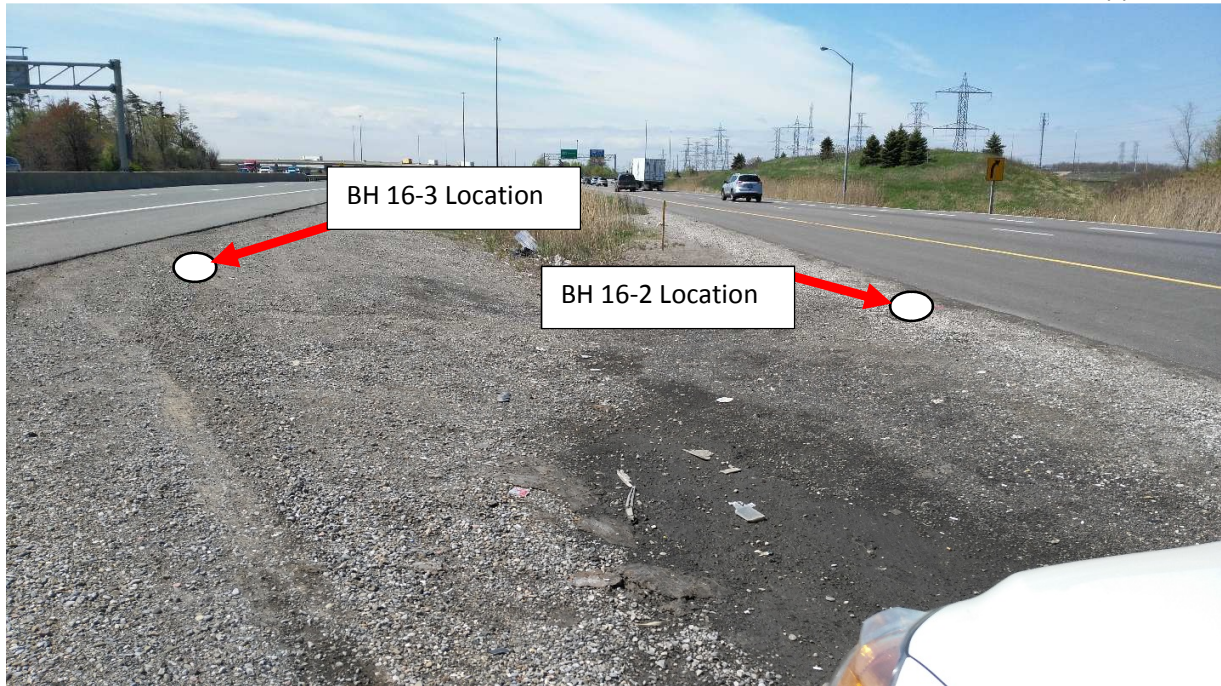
Facing West , near BH16-2 and BH16-3 (Sta. 0+040)
